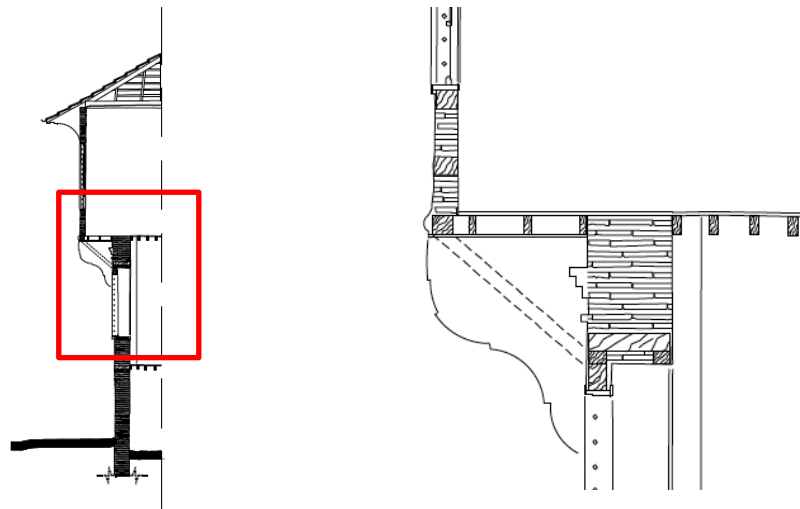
Adana-Tepebağ case study house: On the right, system detail, and on the left timber floor, load-bearing wall and oriel joint detail are shown [1,13].
